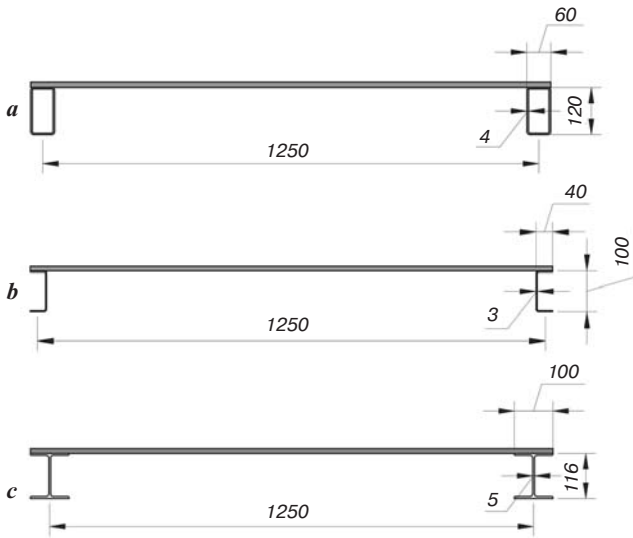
The cross-section of the investigated aluminum-wood composite floor panels:
